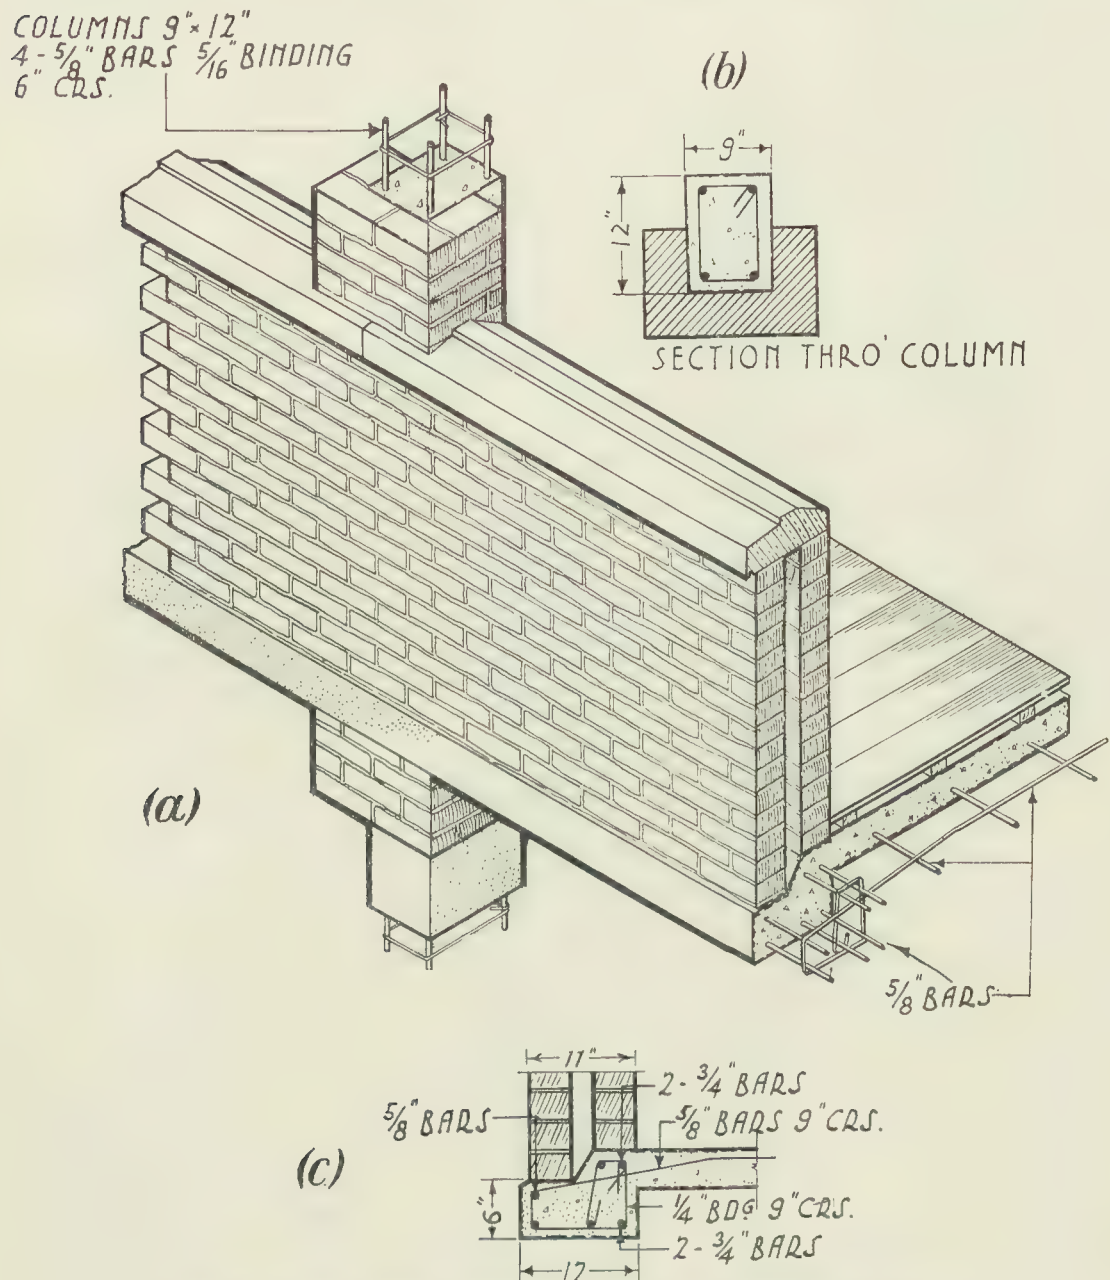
BRICK CAVITY WALL SUPPORTED UPON CONCRETE FLOORS
